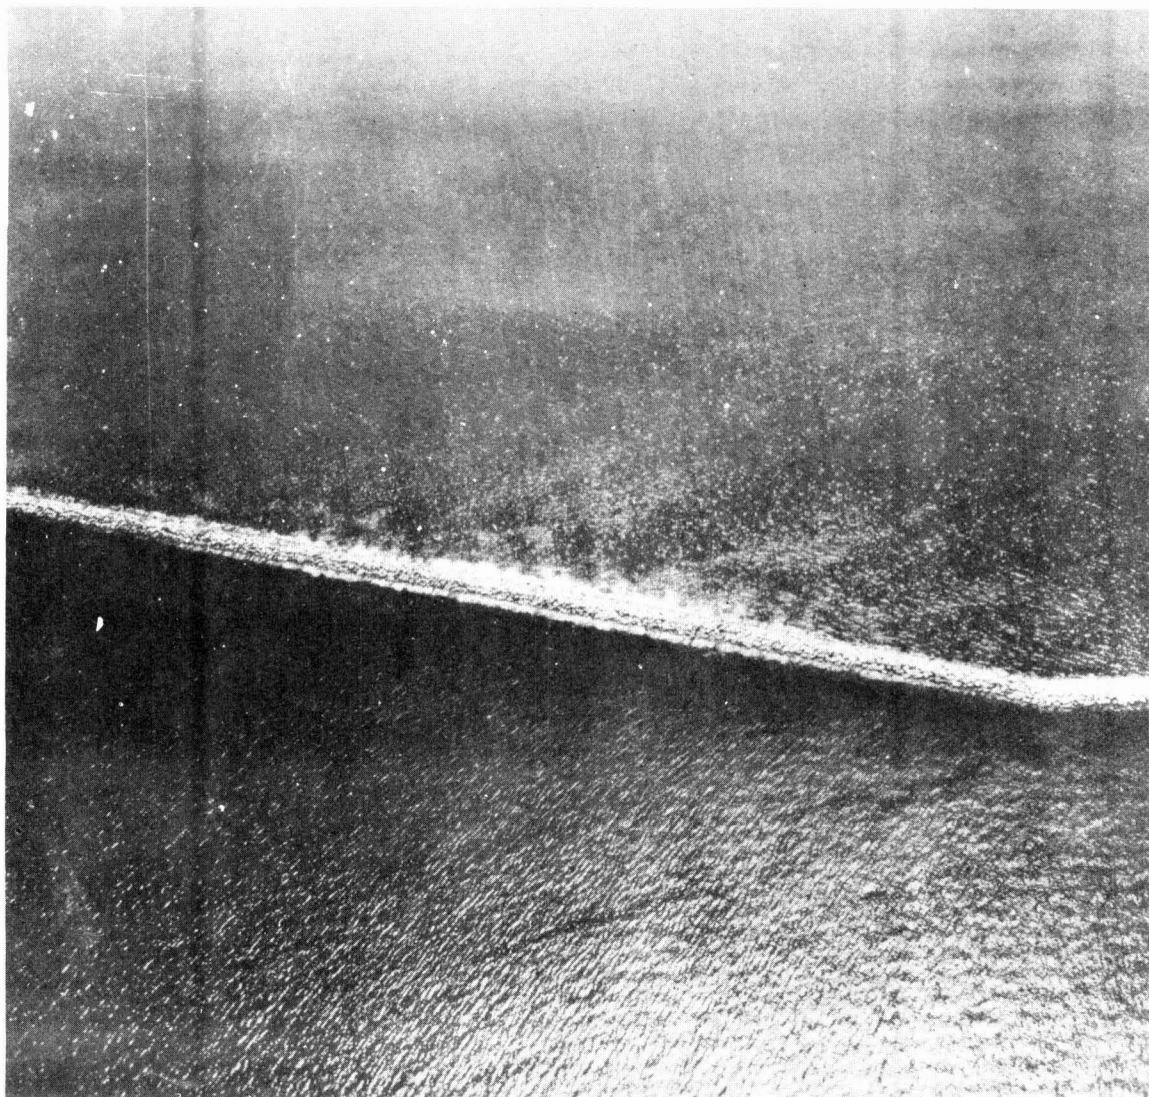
AIR VIEW TOWARD SOUTH FROM ABOUT 1,000 FT. ELEVATION
